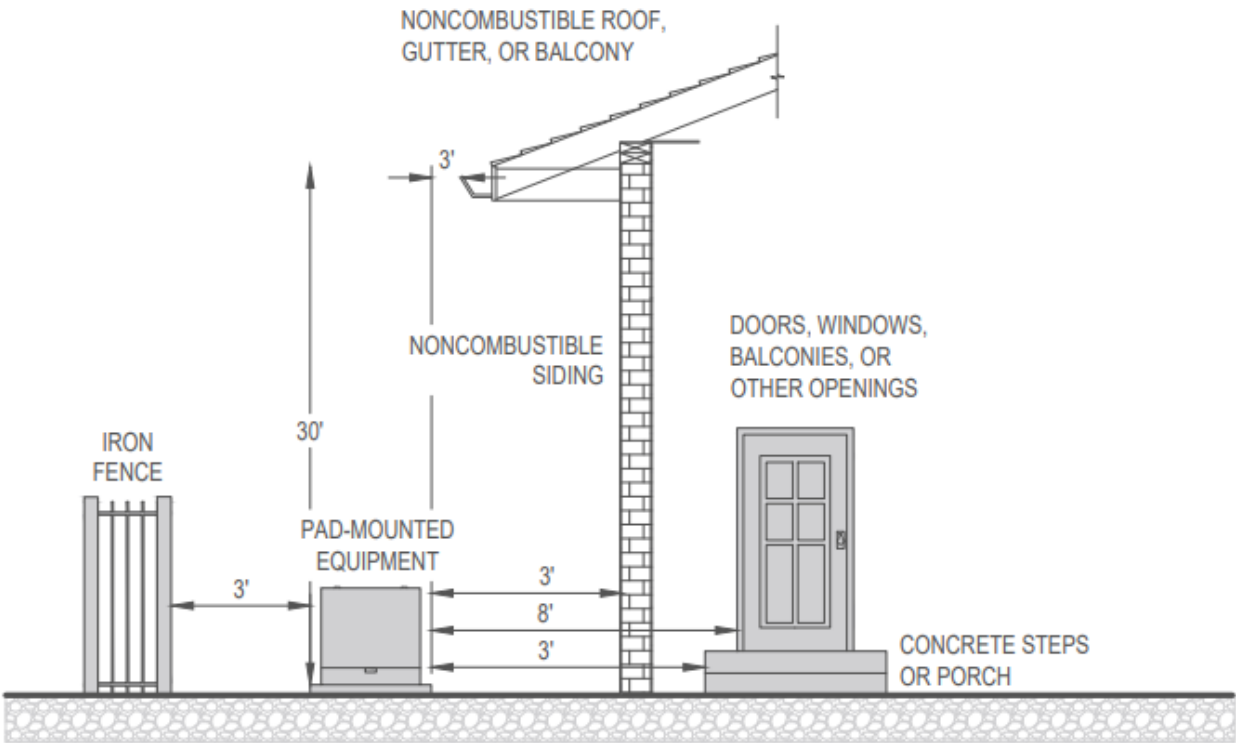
Minimum Clearances from the Side or Back of a Three-Phase Transformer to a Noncombustible Surfaces (STD-D-3215)
